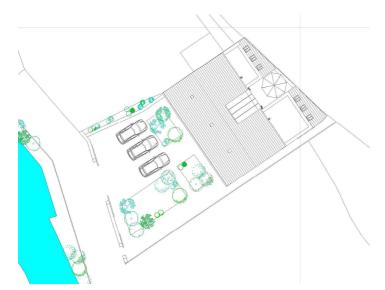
The Old Barn—Site Layout as Proposed (2023)
